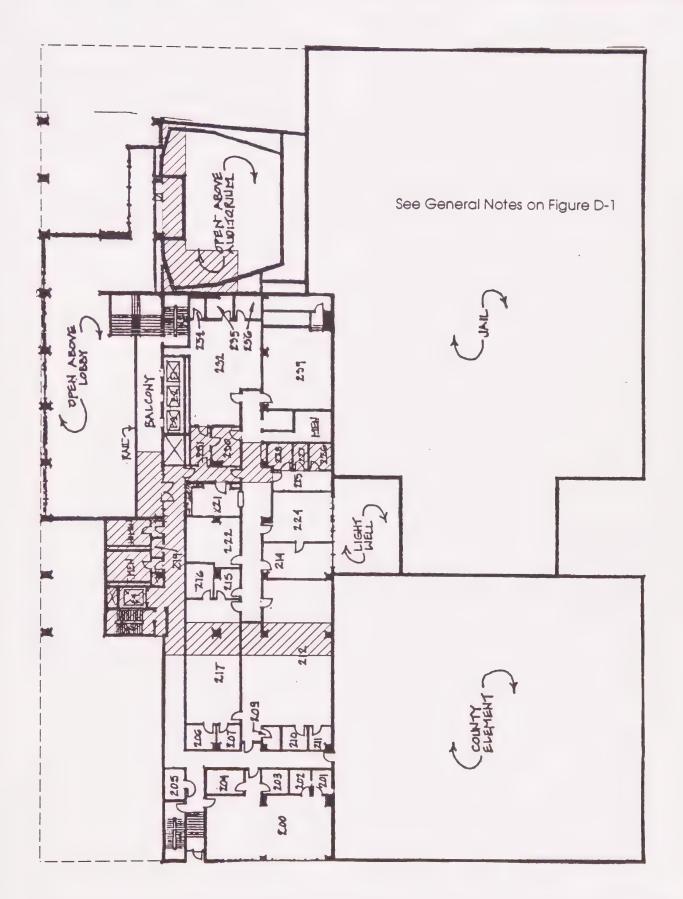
2nd Floor Plan Showing Areas Impacted by Construction
